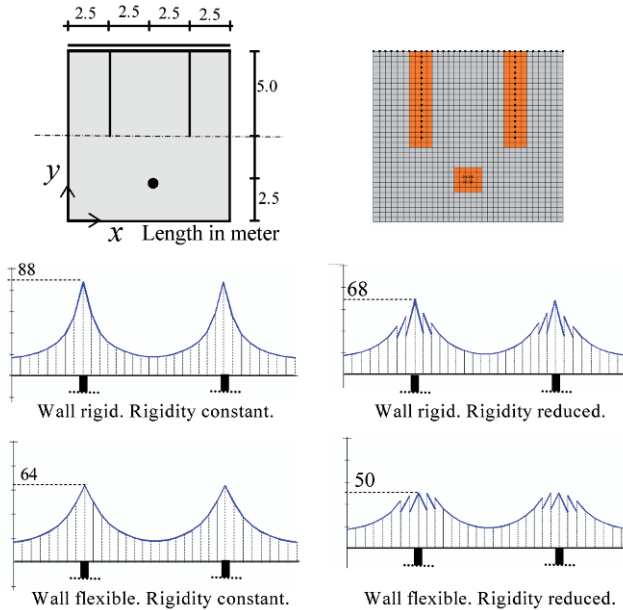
Study about impact of flexible wall and reduced rigidity.
